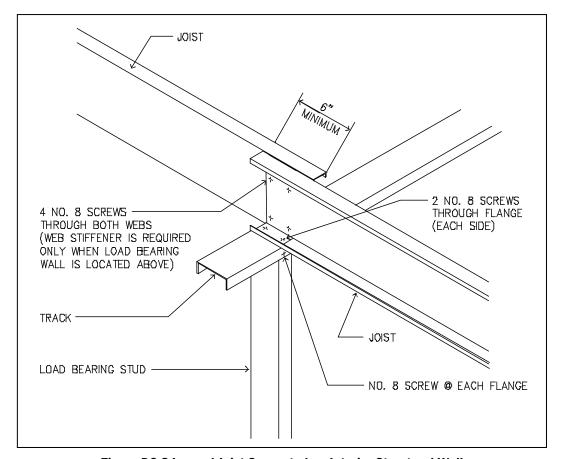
Lapped Joist Supported on Interior Structural Wall
